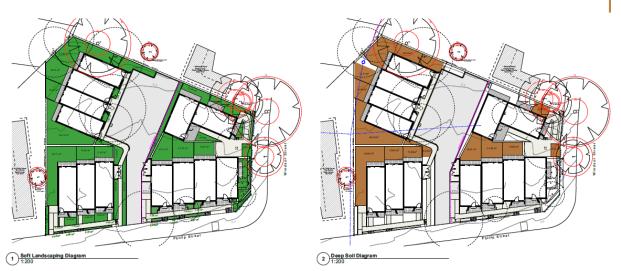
Area of landscaping (green) and deep soil zones (brown) for the proposed development (Source: Stanton Dahl Architects).
